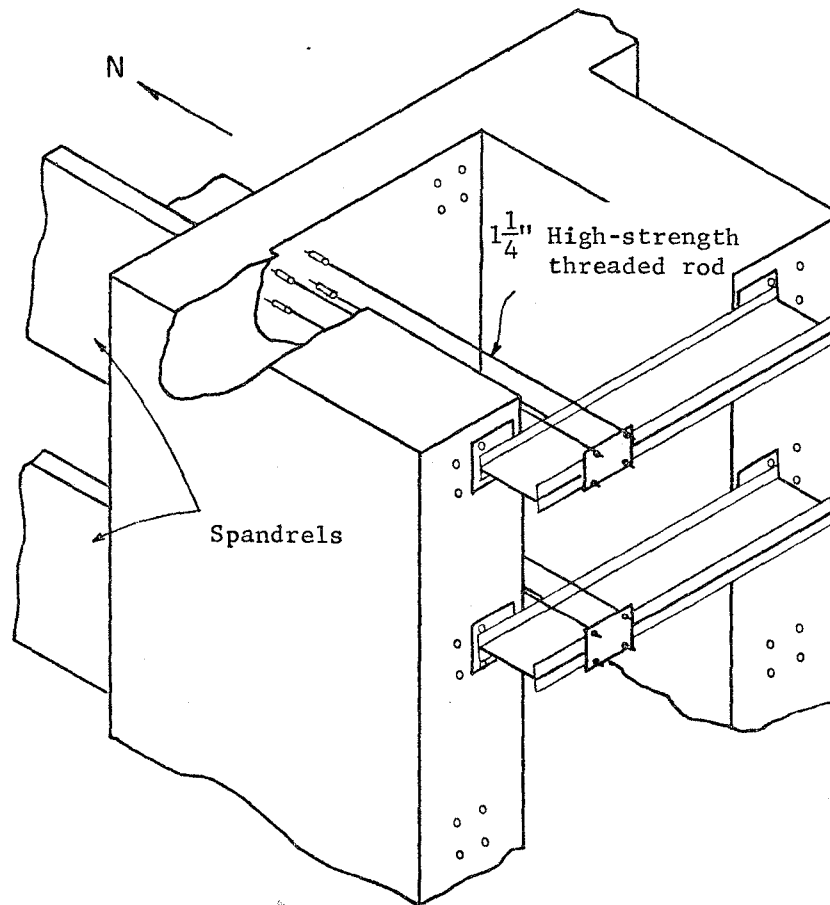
Loading Frame Tension Tie Connection to Reaction Wall
